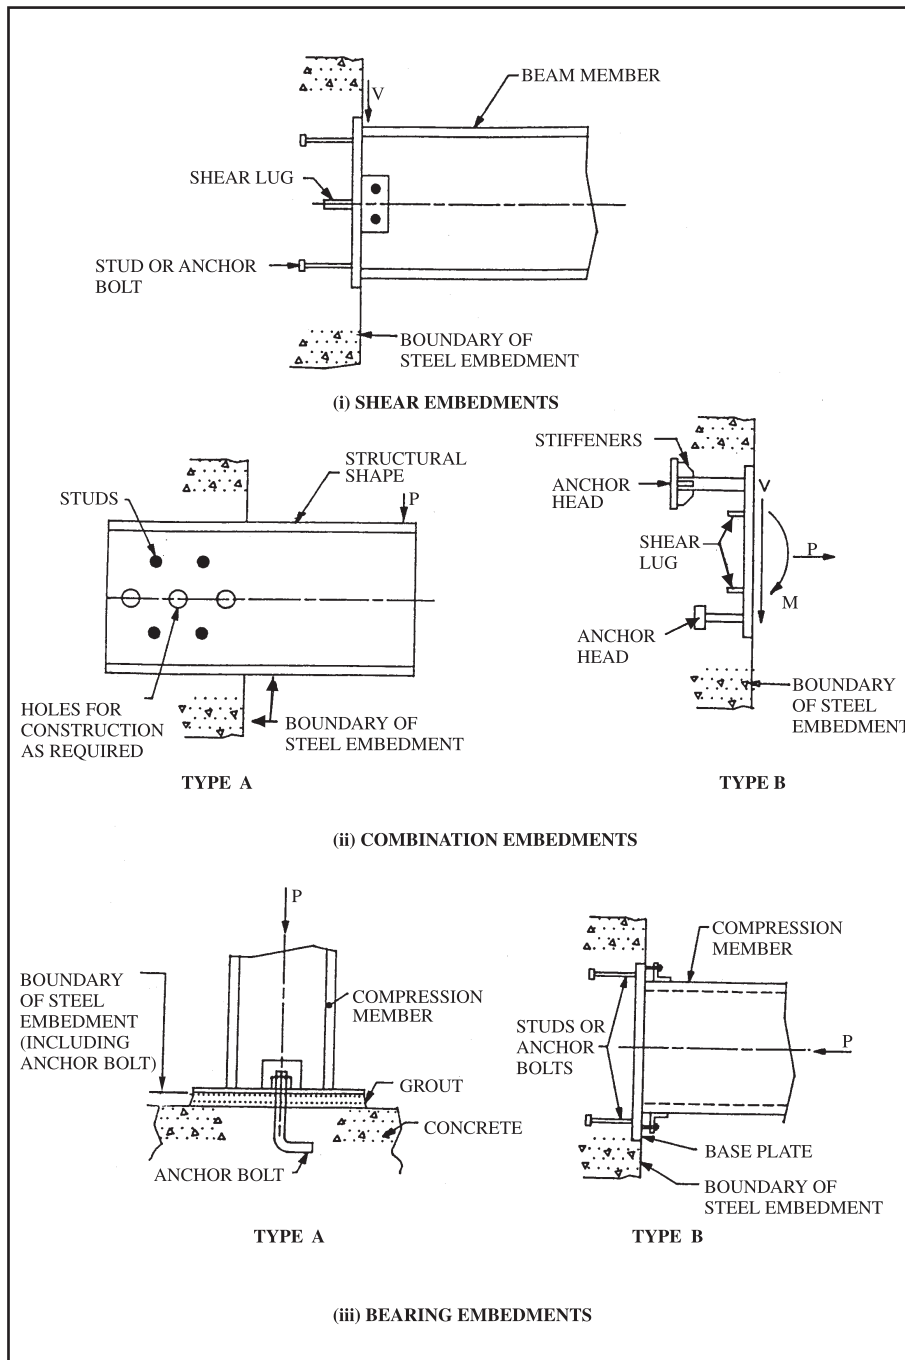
TYPICAL EMBEDMENTS DETAILS
